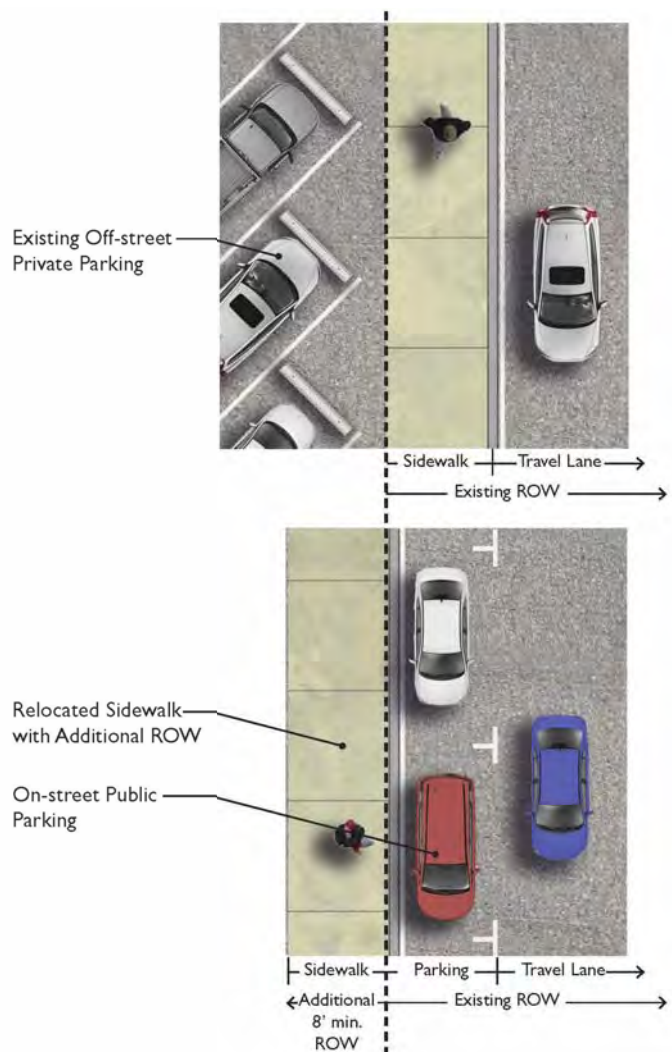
Conceptual Illustration of On-Street Parking on Willamette Street
